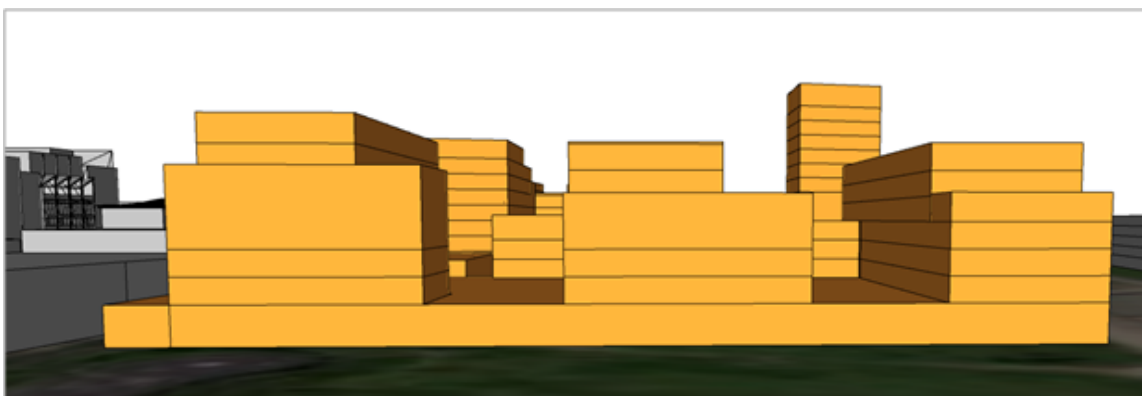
Project Shoreline GA1 - Elevation Layout Block A
